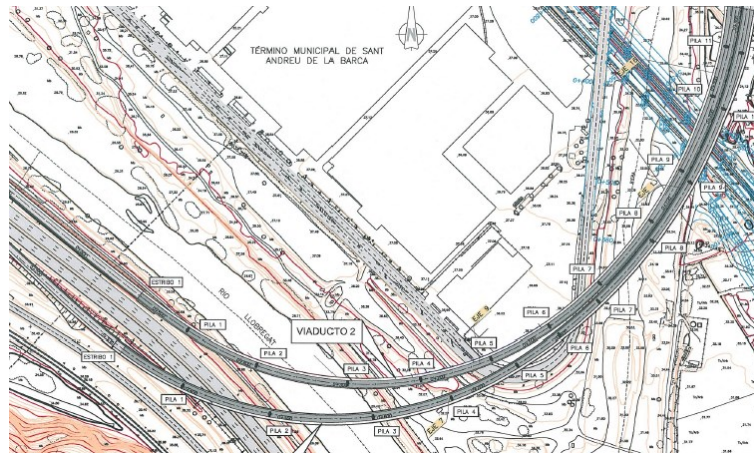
Demonstration site #7: PR-04-B015 bridge.
